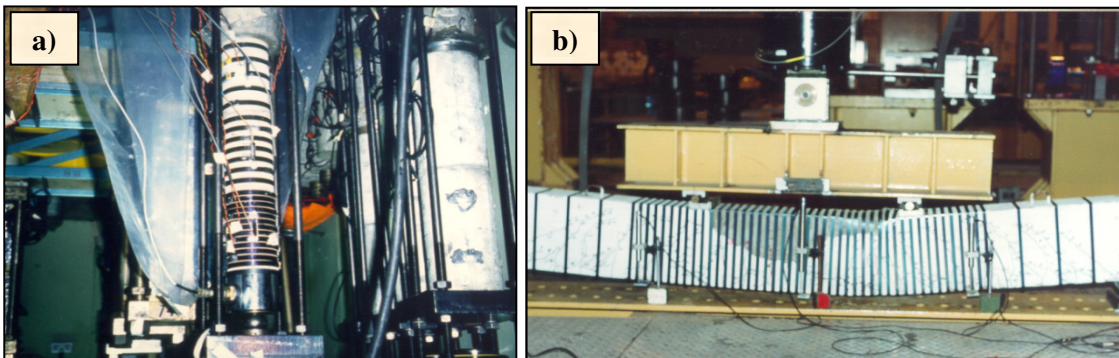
Retrofitted Medium scale RC elements a) columns, b) beams (Frangou, 1996)
